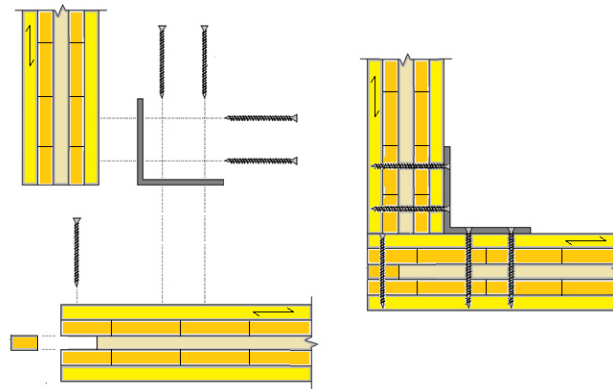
Angle bracket solution for corner wall-to-wall or wall-to-floor connection.
